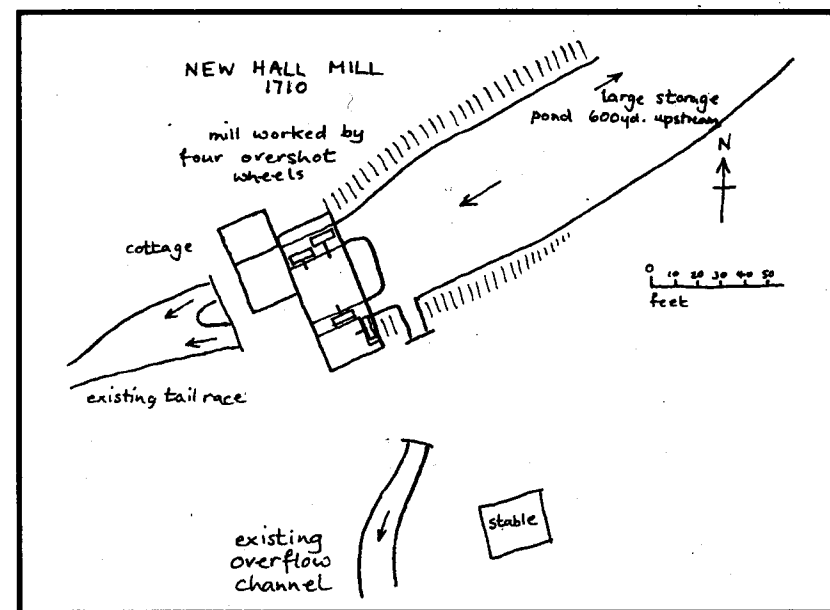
Conjectural site plan of New Hall Mill in 1710.
